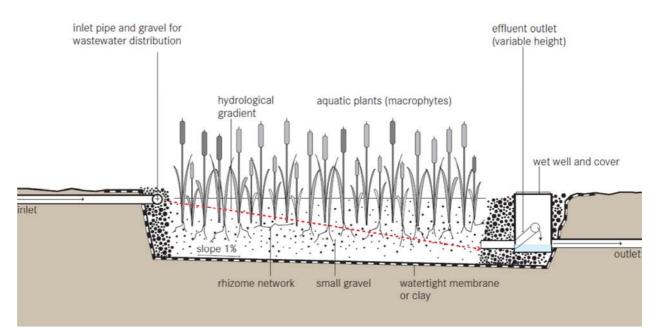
Schematic design of a subsurface horizontal flow constructed wetland (TILLEY et al., 2008)
